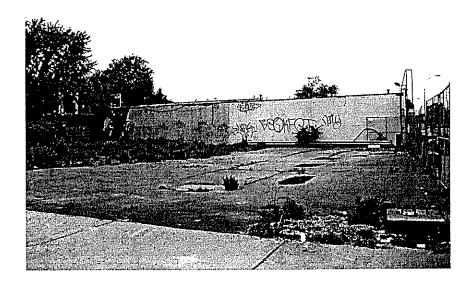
Southeastern corner of project site, view facing north from Hinckley Place.
